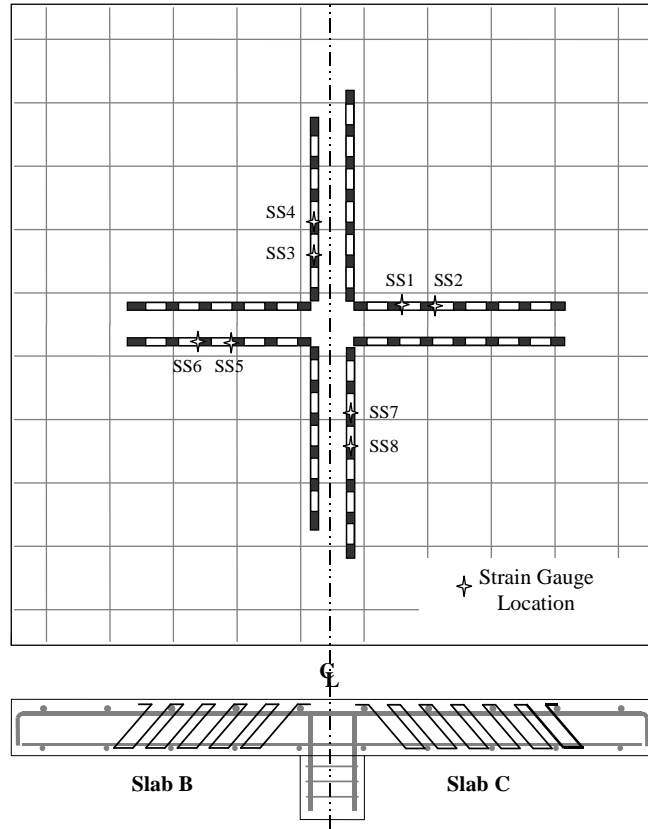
Shear reinforcement of slabs PSSB (left) and PSSC (right)
